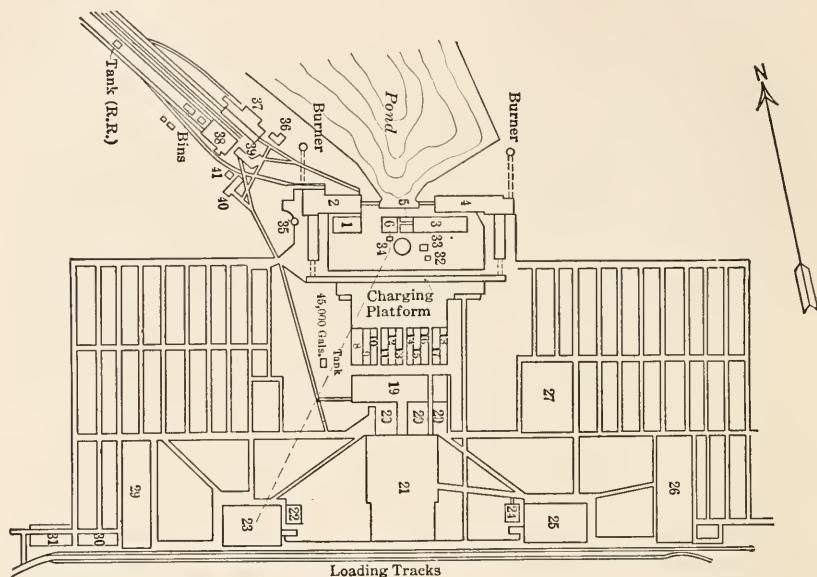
The Ground Plan of a Southern Pine Sawmill Plant having Two Sawmill Units. 1 and 3. Sawmill Power Plants. 2 and 4. Sawmill Buildings. 5. Electric Light Plant. 6. Fuel House. 8 to 18, inc. Dry Kilns. 19. Cooling Shed for Kiln-dried Lumber. 20. Kiln-truck Unloading Platforms. 21, 26, 27, 29, 30, and 31. Lumber Storage Sheds for Kiln-dried and Dressed Stock. 22 and 24. Power Houses for the Planing Mills. 23 and 25. Planing Mills. 32 and 36. Pump Houses. 37. Blacksmith and Car Repair Shop. 38. Round House. 39. Machine Shop. 40. Carpenter Shop. 41. Tinsmith Shop.
